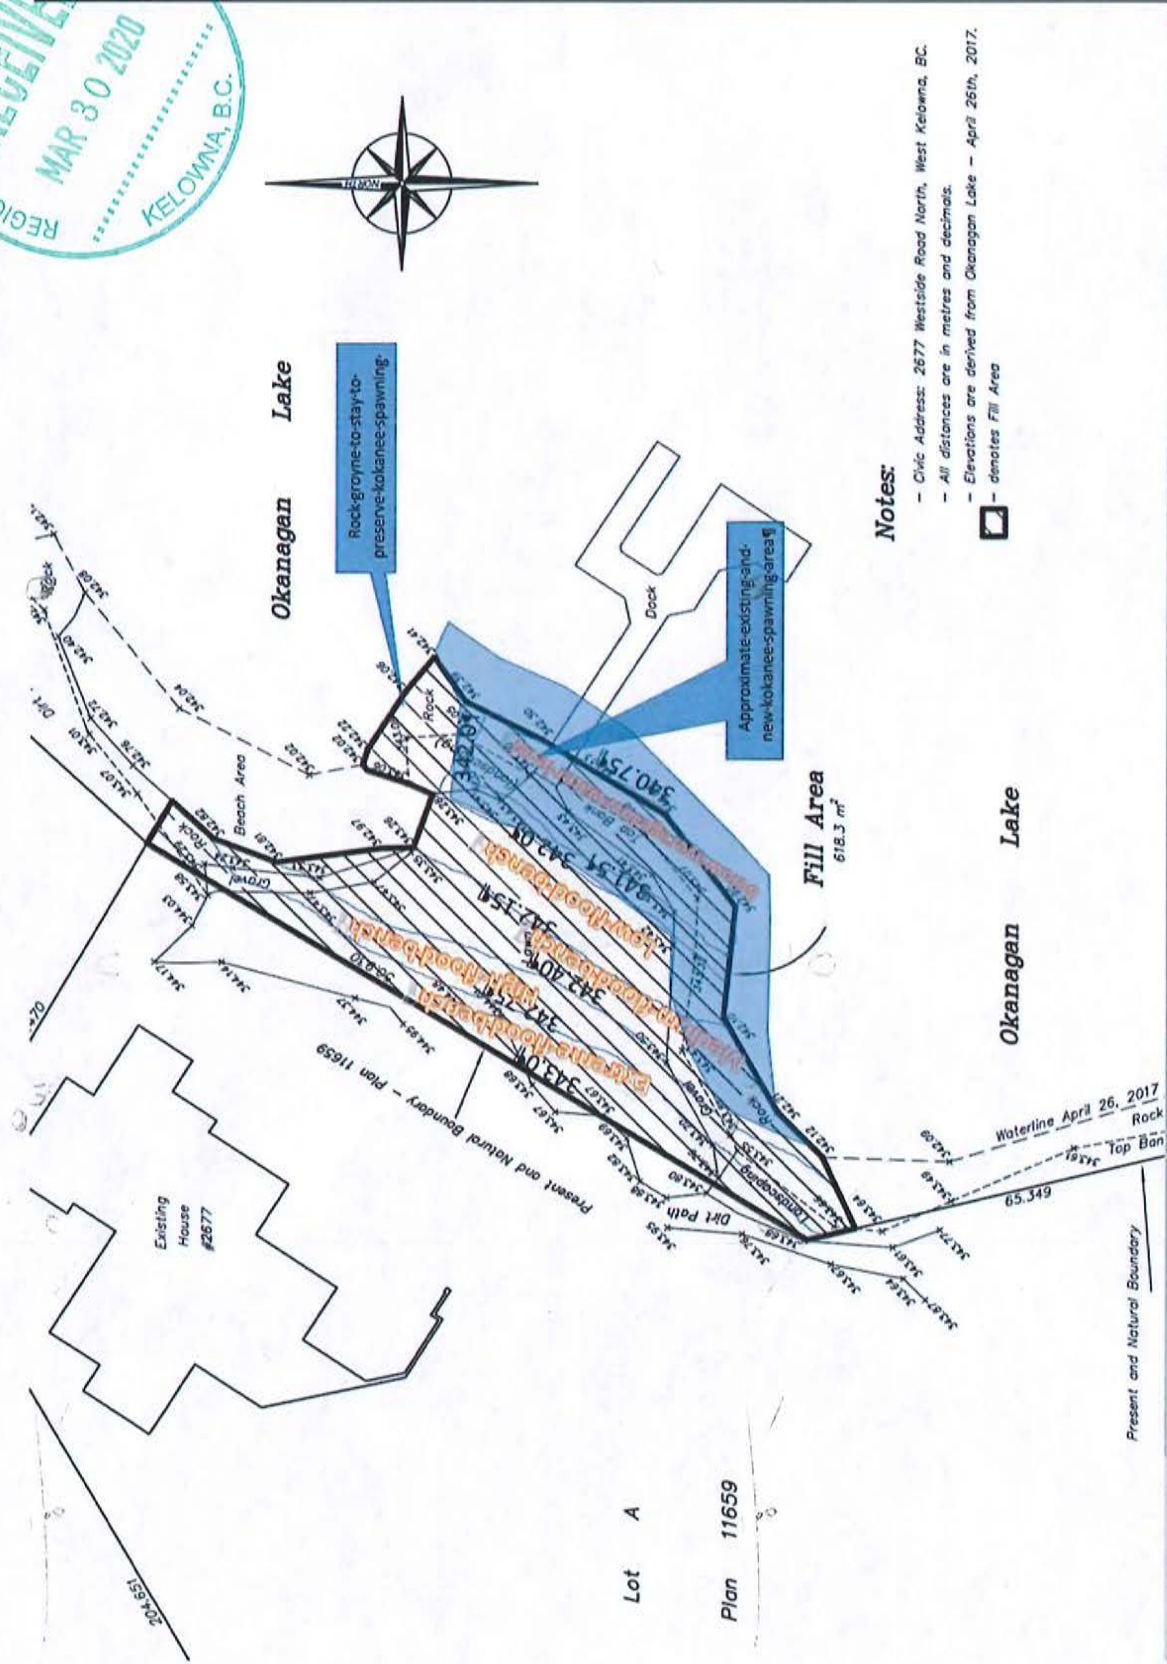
Areas above the average lake level of 342.15 m will be naturalized with large woody debris, large rocks (picked from the existing rip-rap), and native plants that are suitable to the flood regime. See detailed grading plan.
